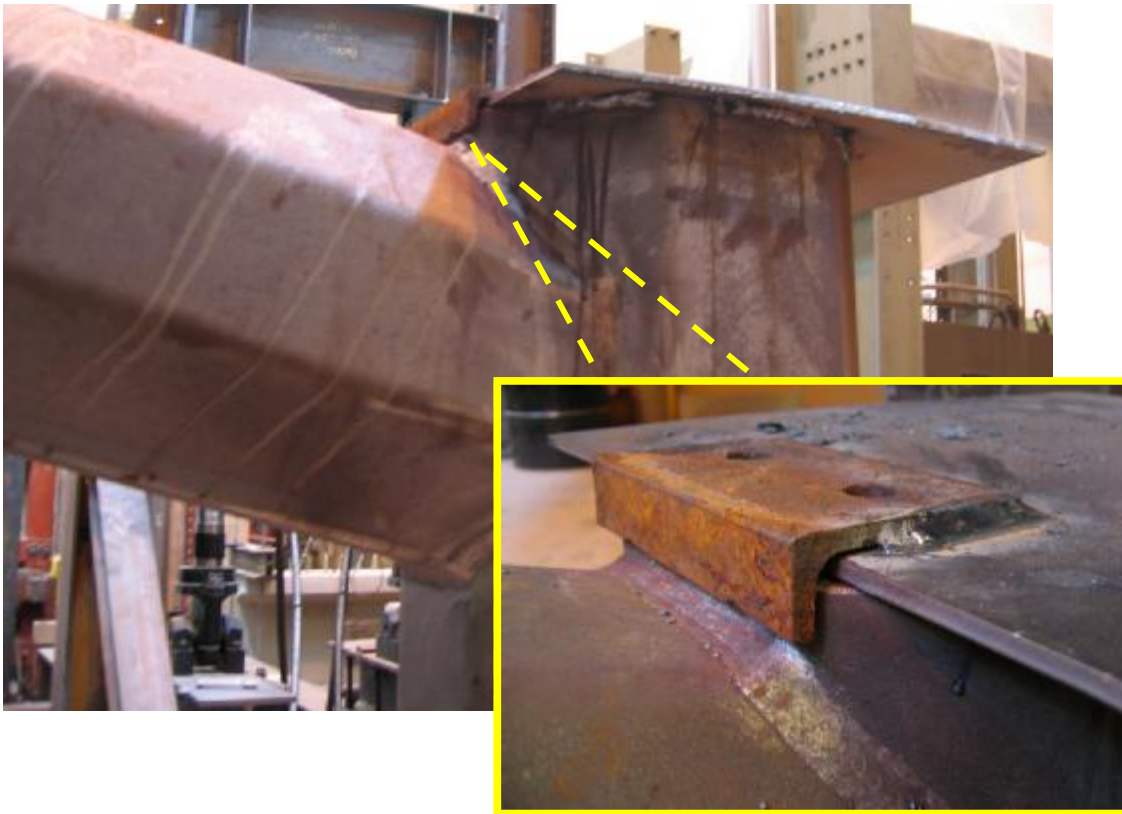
Cap plate welded to Type II mast can.
